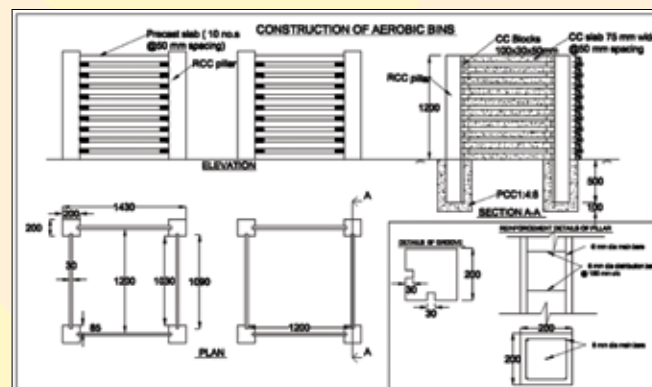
Plan, Section and Elevation of Aerobic Bin Composting Unit
